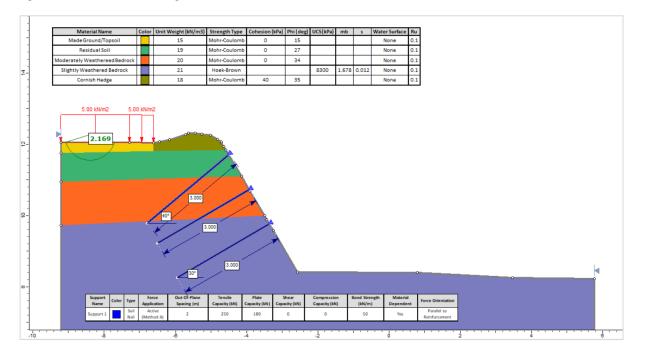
Section 1 – Soil Nailing - BS8006 Set2
